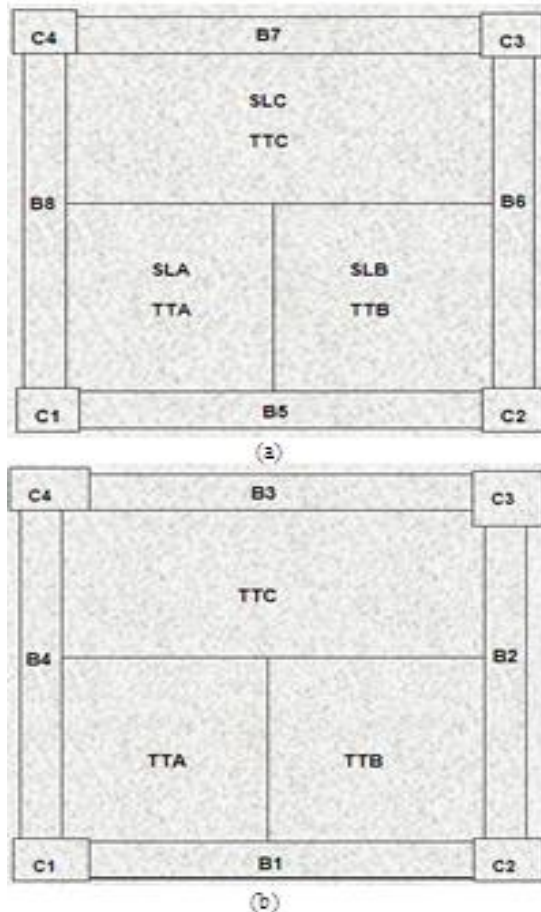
Notation of beams, columns and slab in a compartment (a) top floor (b) lower floor (Plan view)
